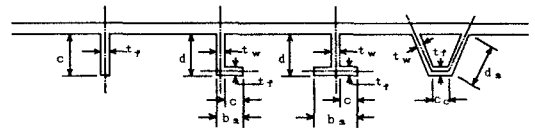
Assumed Cross-Sections of Longitudinal Stiffeners
